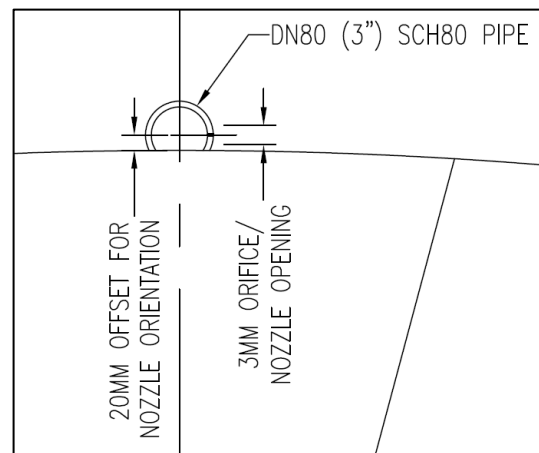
Section through skirt and nozzle pipe looking down showing nozzle detail.
